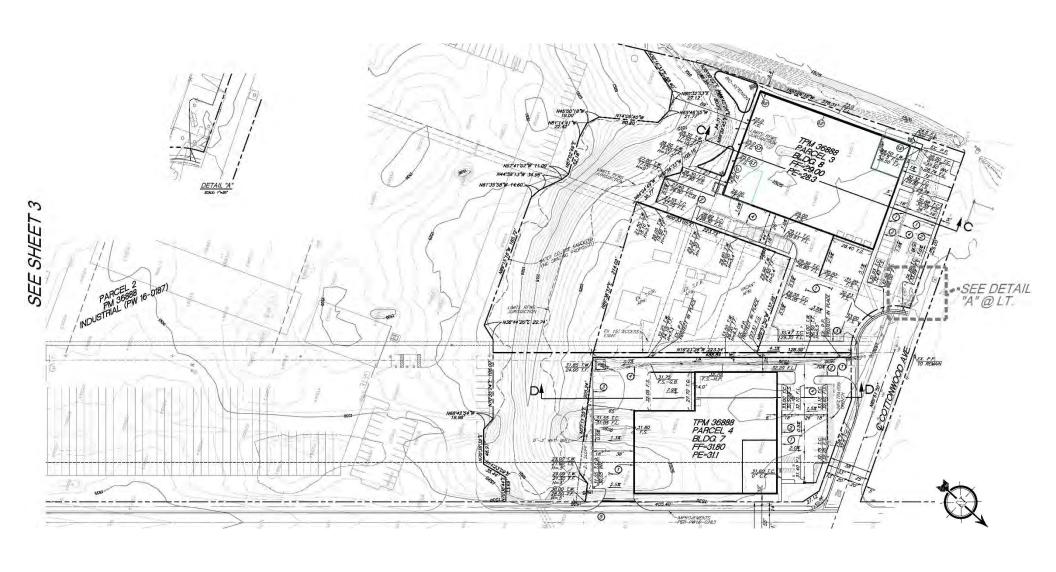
Project Plans (Preliminary Grading Plan)
